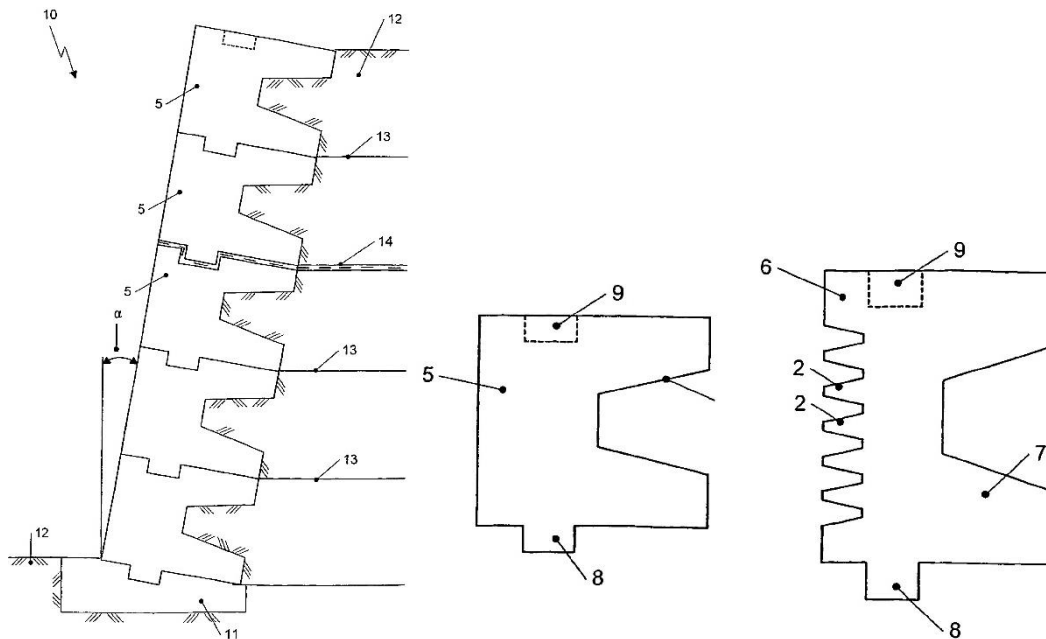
Inclined wall with block elements (left); block elements (right)
